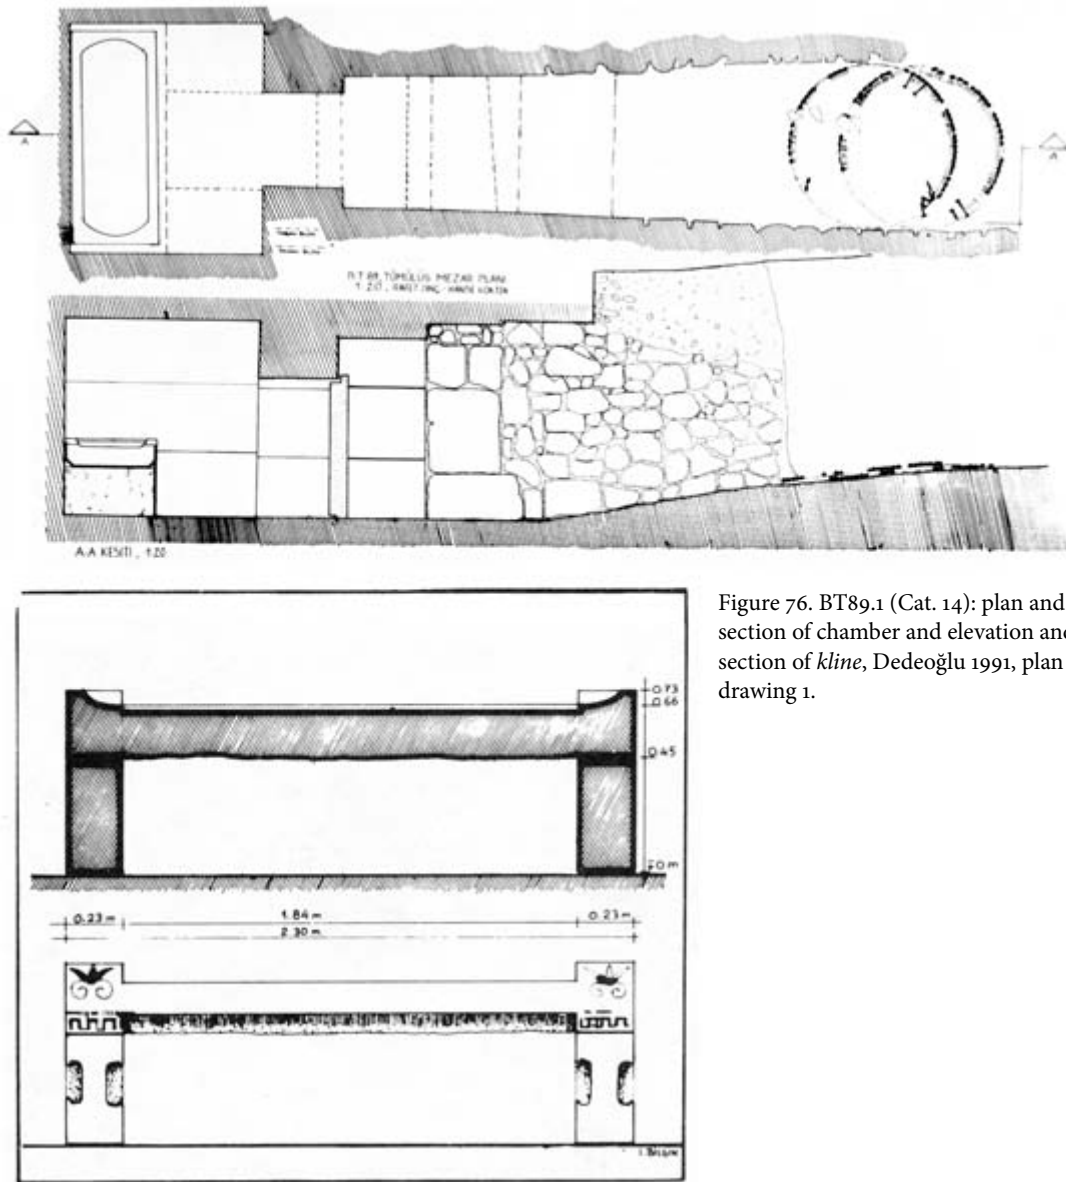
BT89.1 (Cat. 14): plan and section of chamber and elevation and section of *kline*, Dedeoğlu 1991, plan 2, drawing 1.
